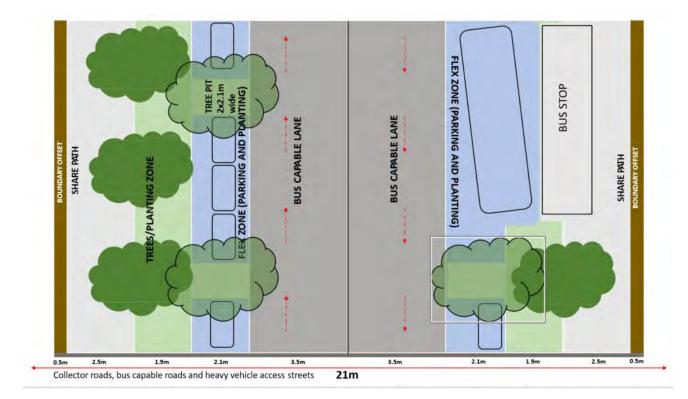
Section 1 Collector roads, bus capable roads and heavy vehicle access streets
